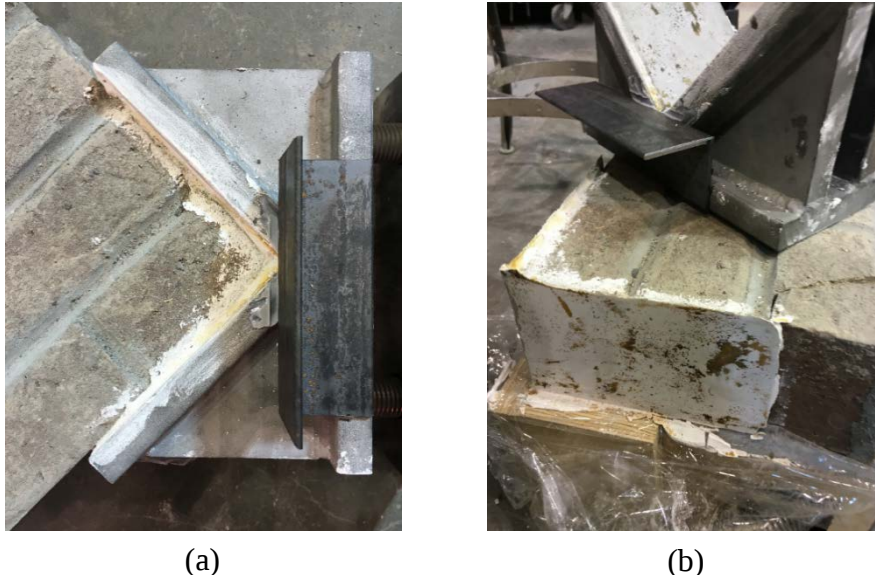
(a) Hydro-Stone bond between corner of specimen and loading shoe (b) loading shoe taken off following the test showing that a uniform bearing surface was attained
